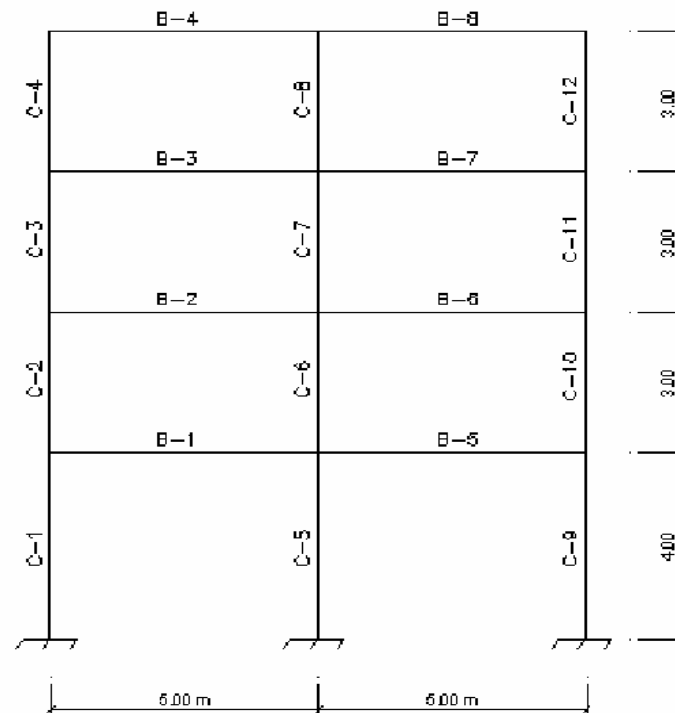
Typical RC building frame of 2 bays and 4 floors
